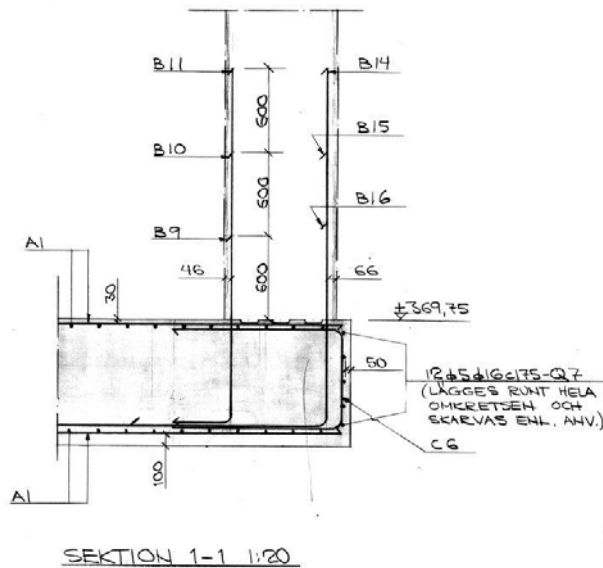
Detail for the joint between the silo outer wall and the slab.
